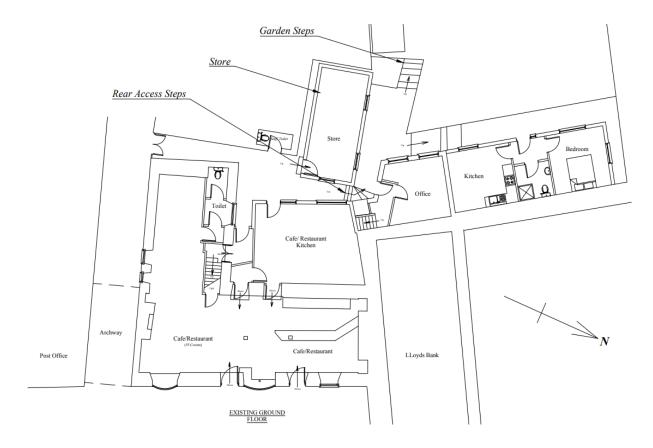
Existing ground-floor plan of Kavorna (approximate scale 1:100) (P. Osborne).
